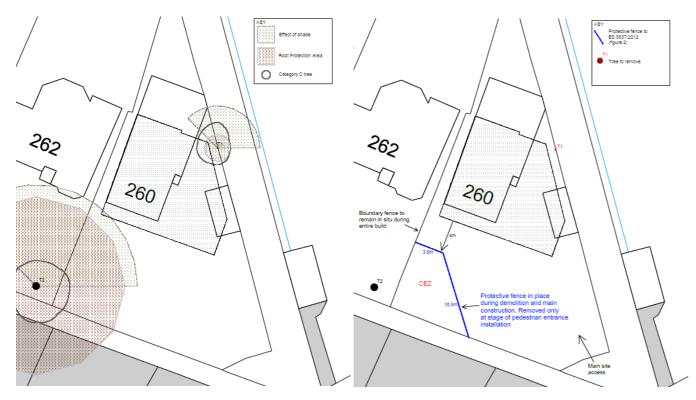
Tree Constraints Plan, left, and Tree Protection Plan, right, showing a Purple Plum Tree of Category C located on site for removal, and an Oak Tree of Category C located on the neighbouring property to be protected during construction
